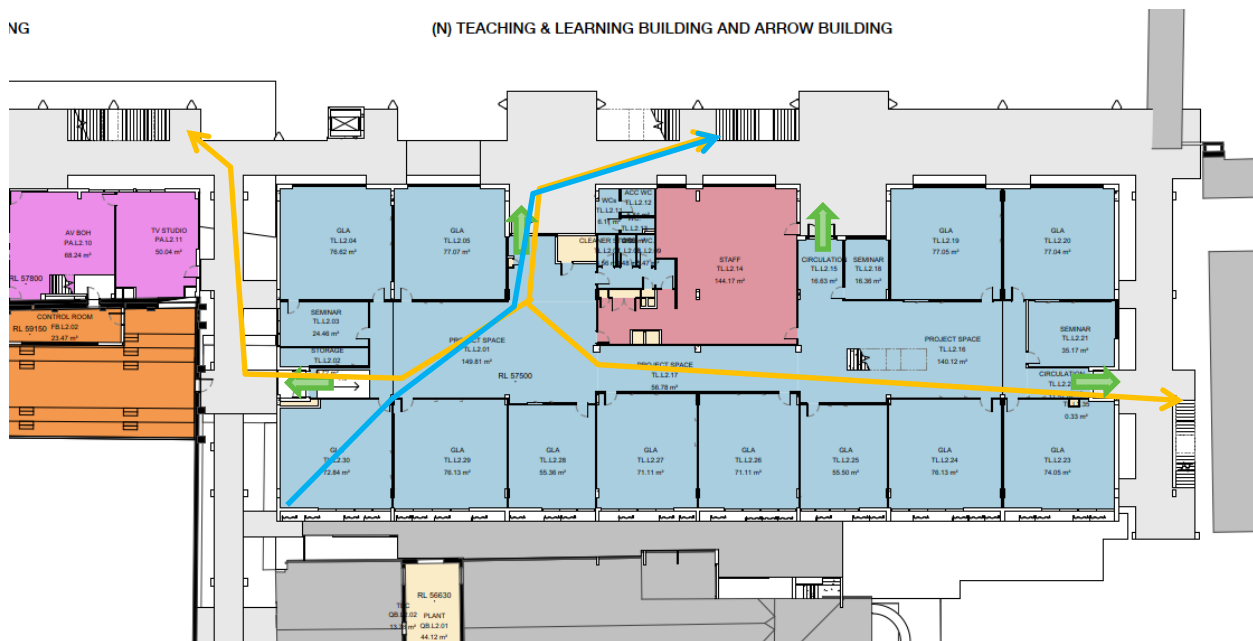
Egress to the arrow building from the T&L Precinct (Level L2 shown)
